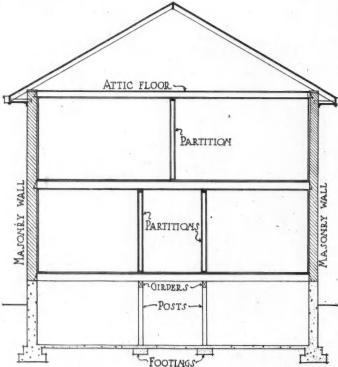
Section through Building, Showing Floors and Location of Partitions.
